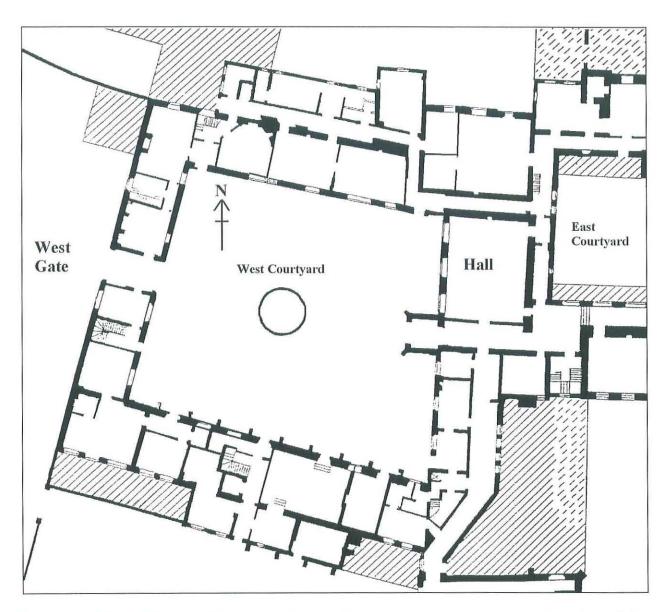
Plan of the north-west section of Fulham Palace showing the location of the Hall and the West Gate discussed in this report
